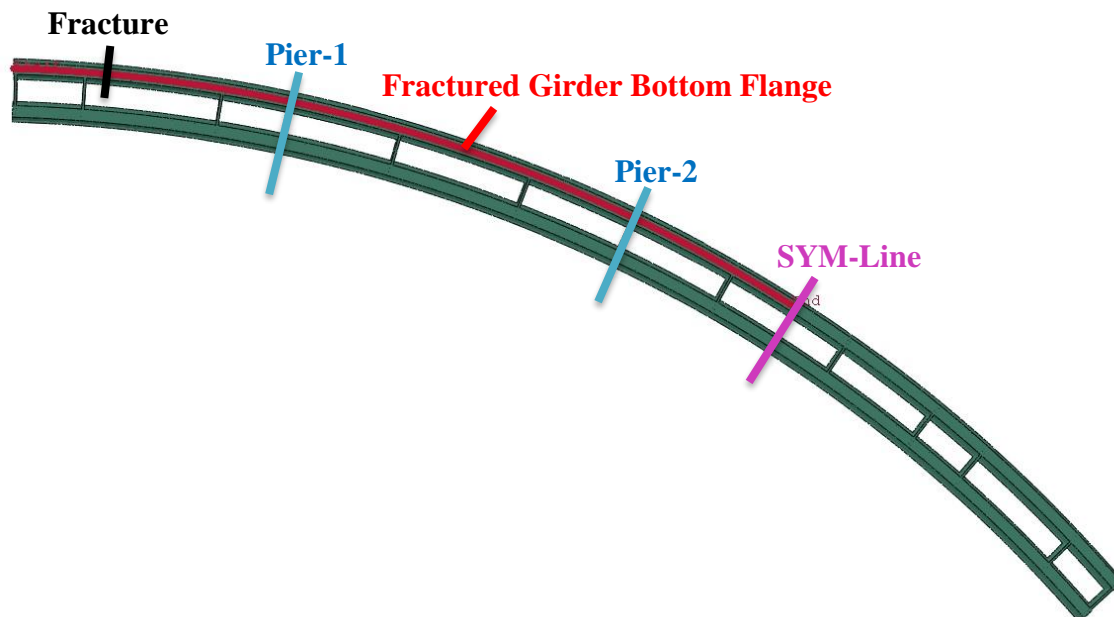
Fractured girder bottom flange (bottom view)
